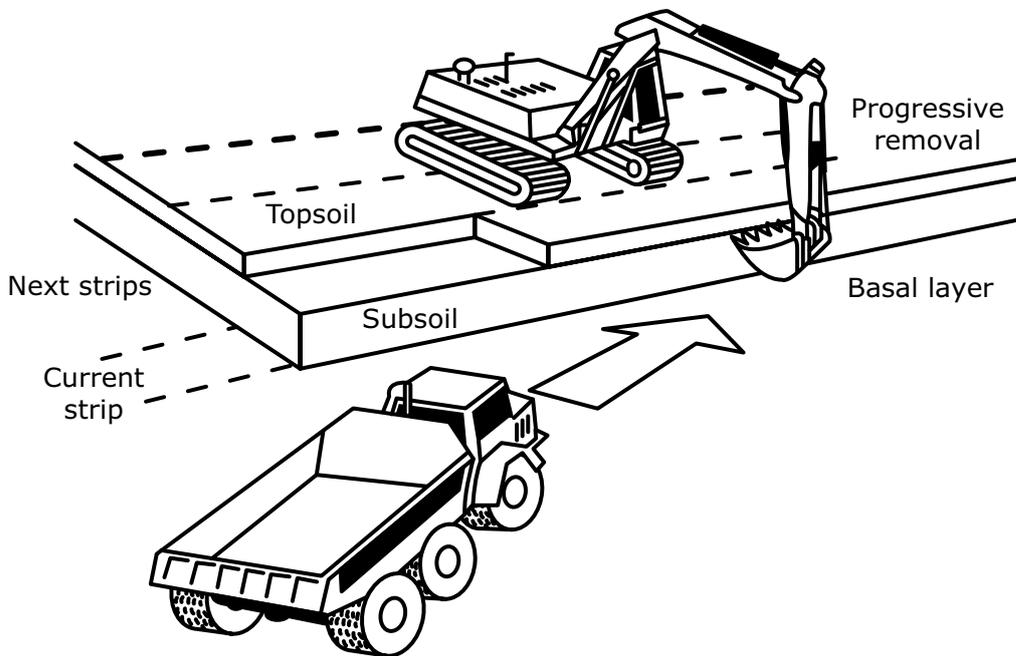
Stripping with excavators and dump trucks: removal of topsoil from a strip.
